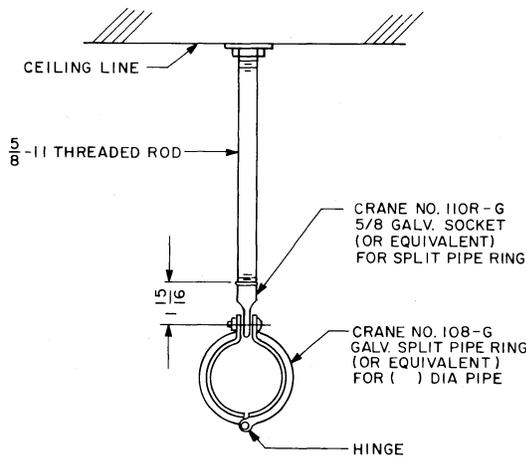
Conduit Support for Single KS-5351 Conduit Where Auxiliary Framing is Not Used
